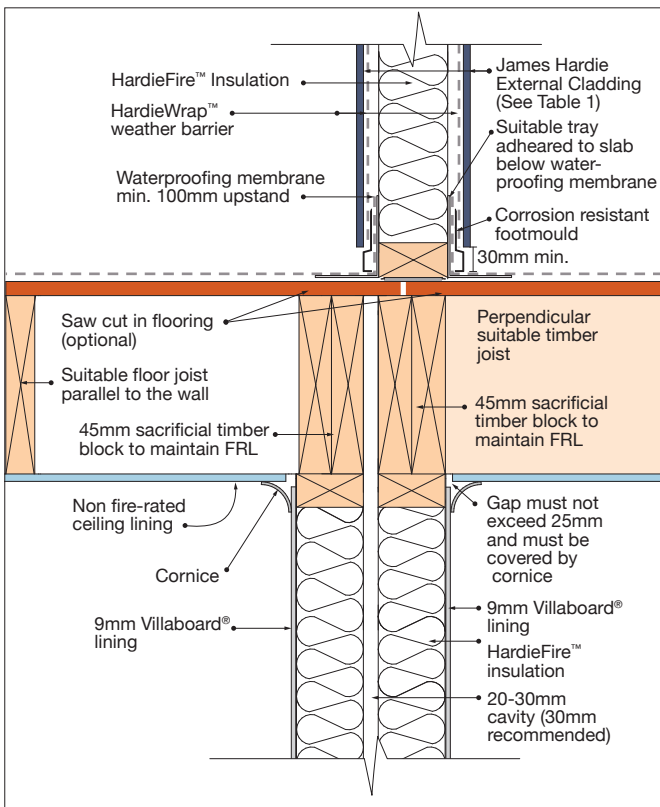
HARDIESMART™ BLADE WALL FLOOR JUNCTION WITH HARDIESMART™ INTERTENANCY WALL BELOW
